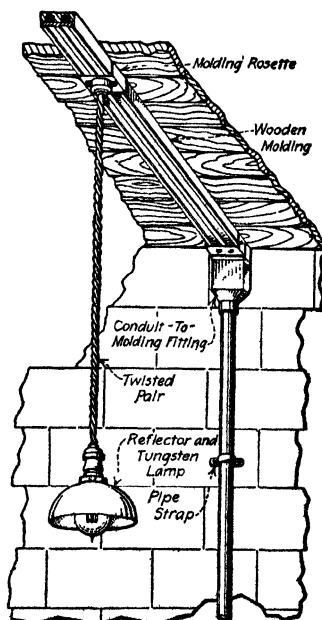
Side-wall conduit feeding moulding run. (Crouse-Hinds.)
